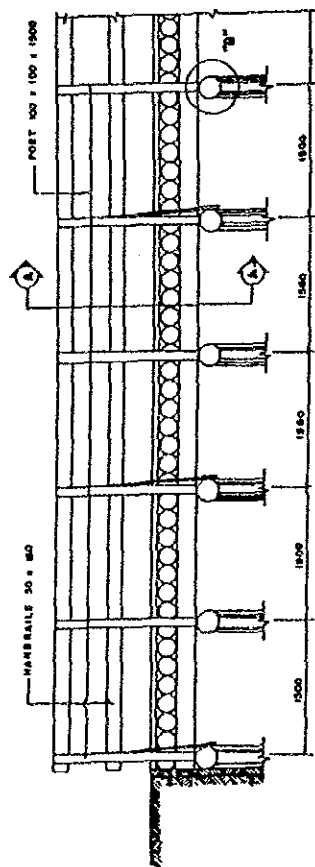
ADDITIONAL SUPPORT FOR WEAK BAILEY BRIDGE AND TIMBER BRIDGE
